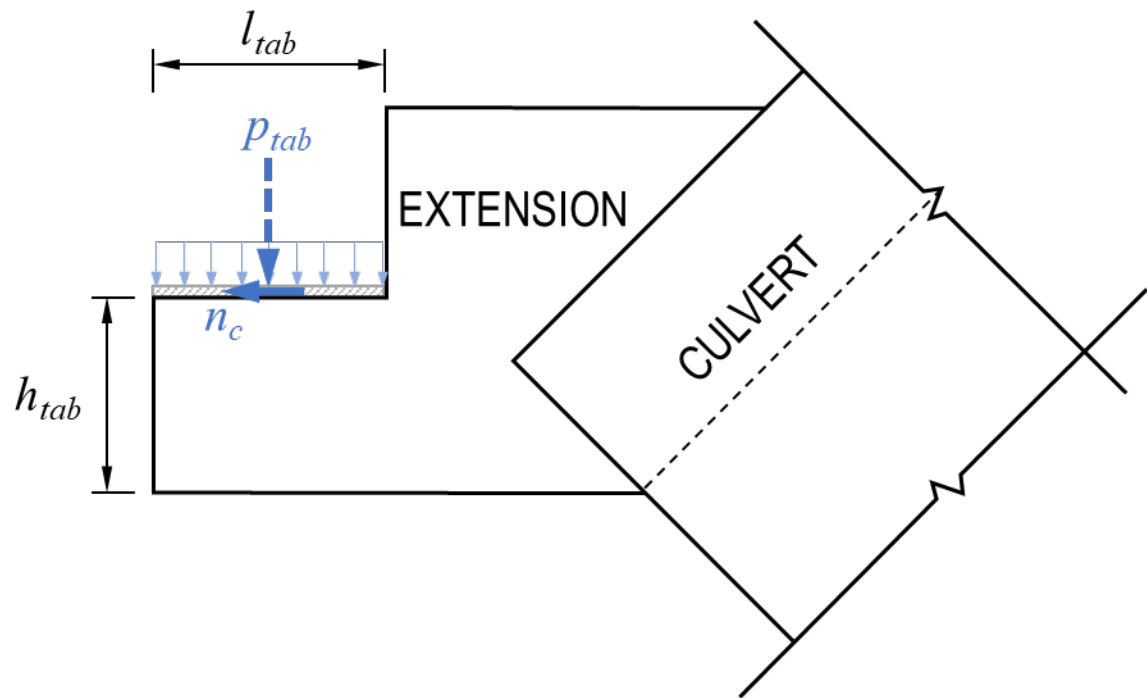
Plan View of Culvert Tab Extension with Loads
